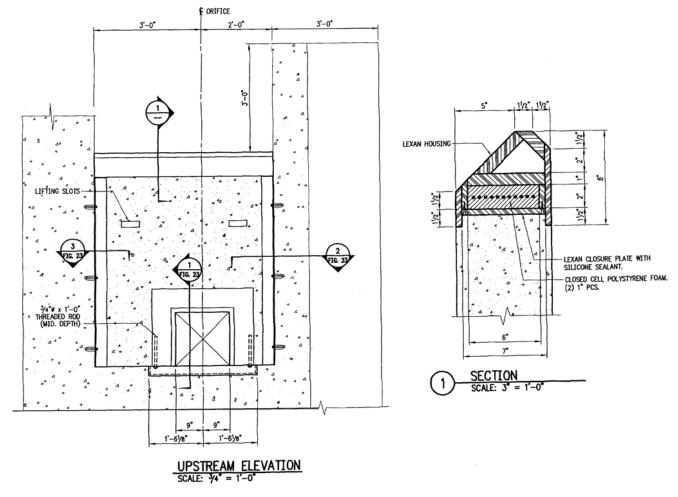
Oifice/Weir Antenna Housing - Elevation and Section (Fiberglass Reinforced Concrete)
